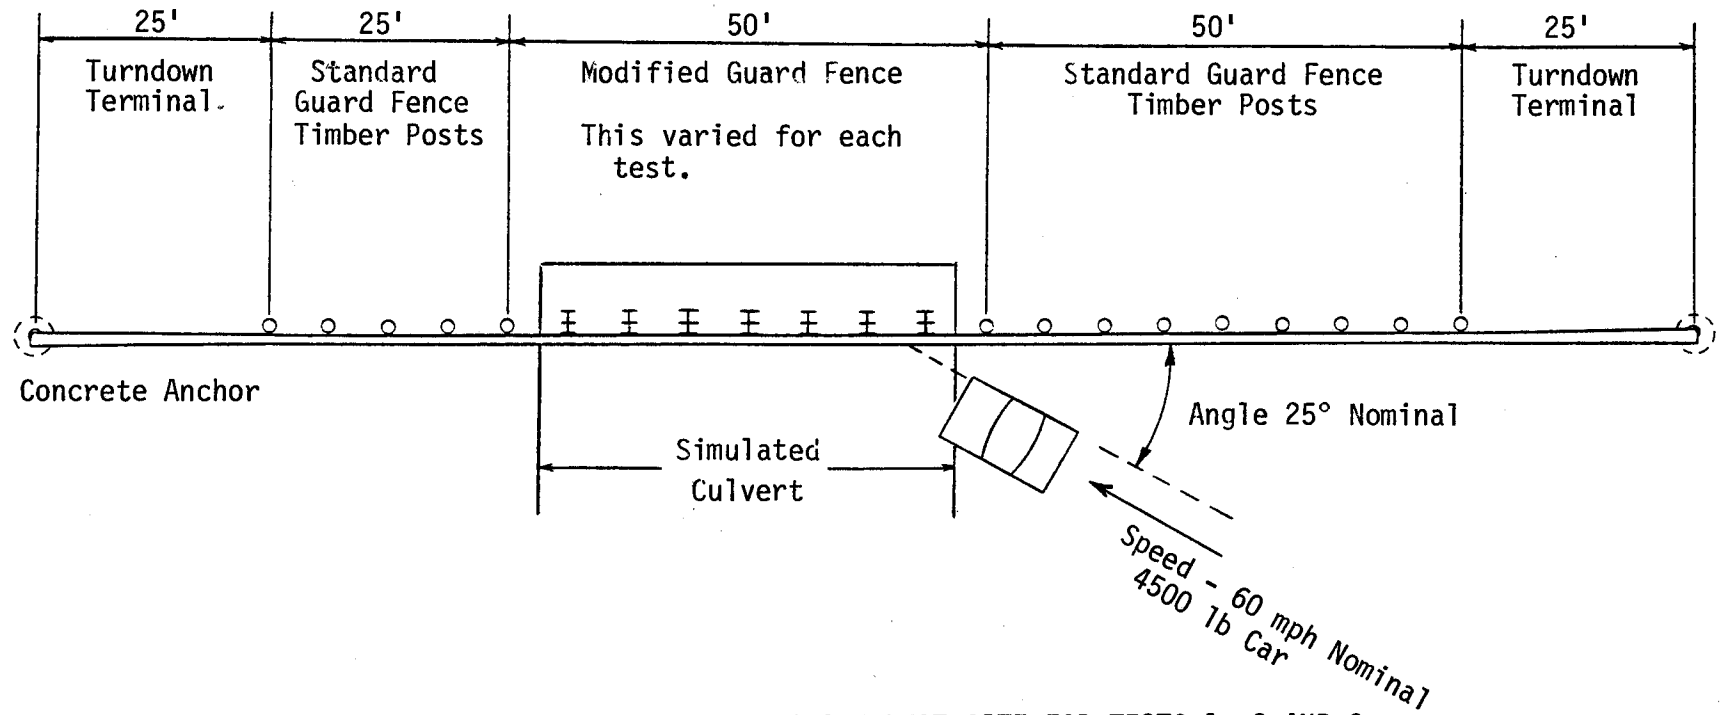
PLAN VIEW OF TYPICAL CRASH TEST SITE FOR TESTS 1, 2 AND 3.
